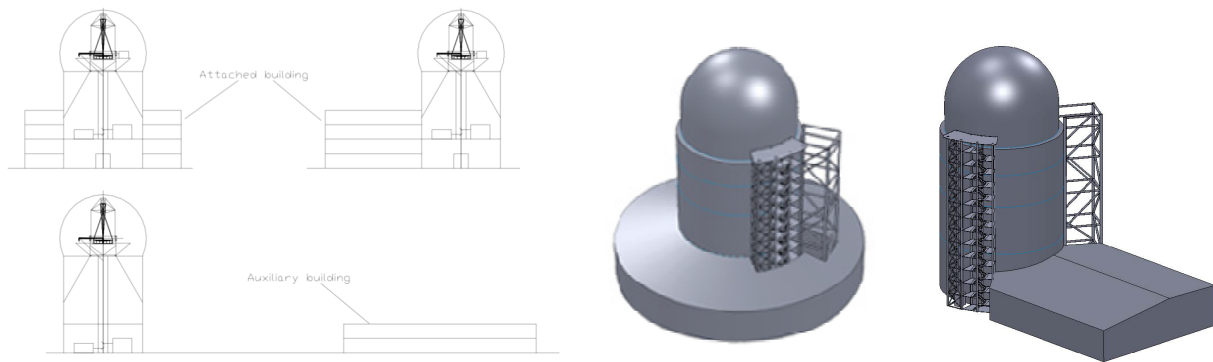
(Left) Three different concepts for the building: a) building around pier; b) box-shaped building attached to pier; c) separate building. (Right) 3D models of circular building and box-shaped building.
